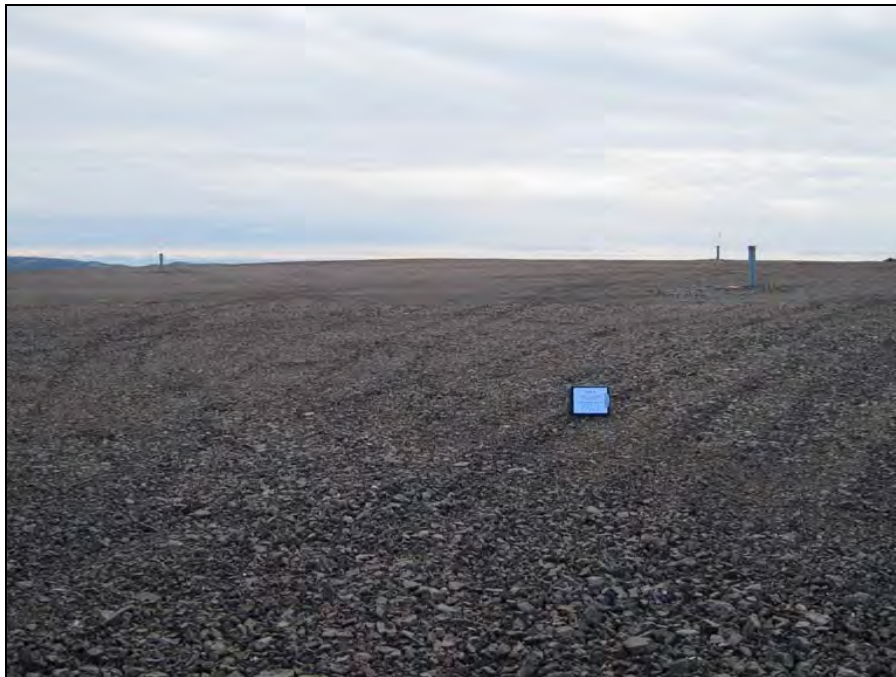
B. Northwest corner of landfill facing south along crest. ↑
